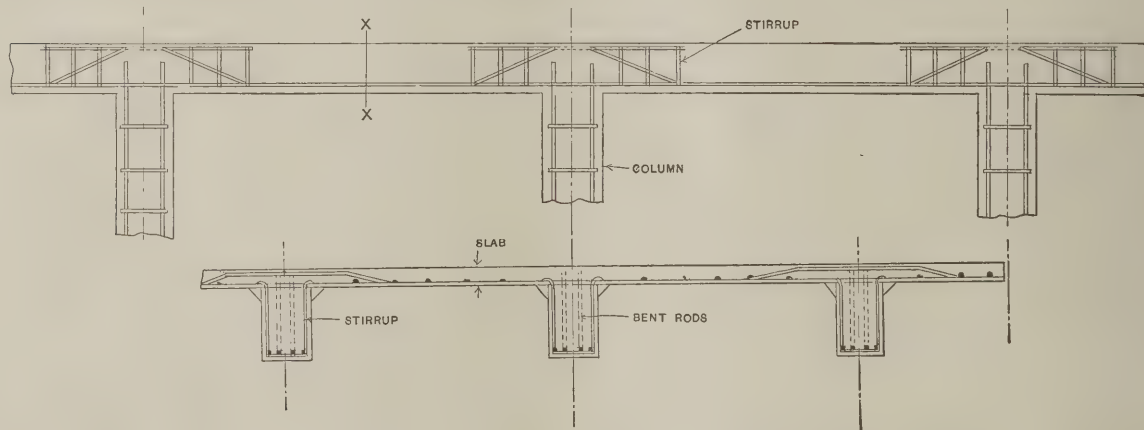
A Typical Beam and Slab Section, Showing Arrangement of Reinforcing Material.
